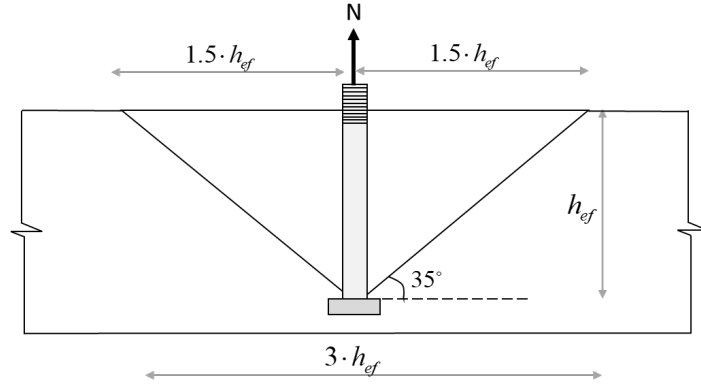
Idealized section through concrete breakout cone (redrawn from ACI 318-19)
